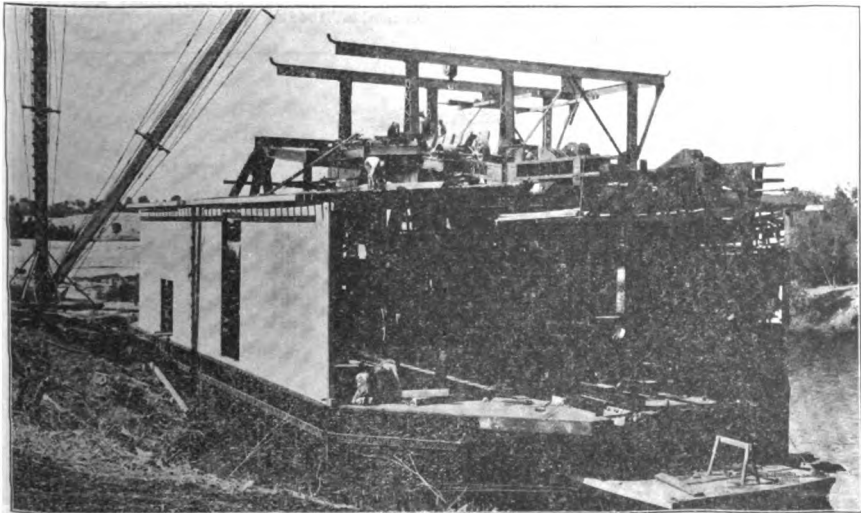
Pacific Gold Dredge under construction below Park's Bar Bridge on the Yuba River, Yuba County. September, 1916.
